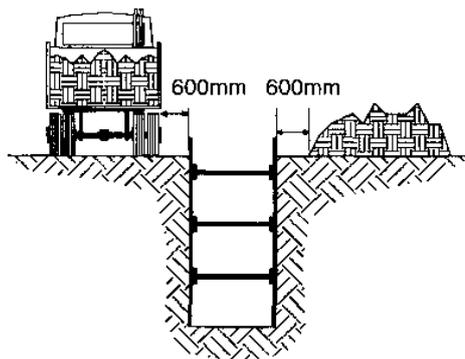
Excavation with Shoring Designed for Surcharge Loads.
